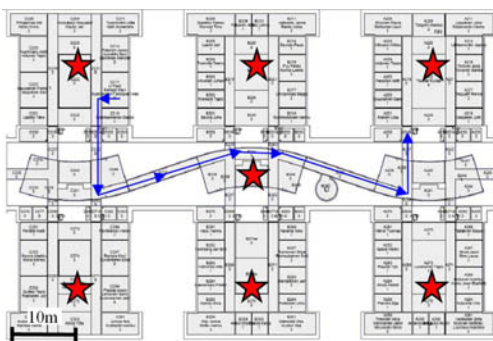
Trial route (blue arrowed line) and access points' locations of WLAN (red stars) on the floorplan of Digitalo office building, floor 2.
